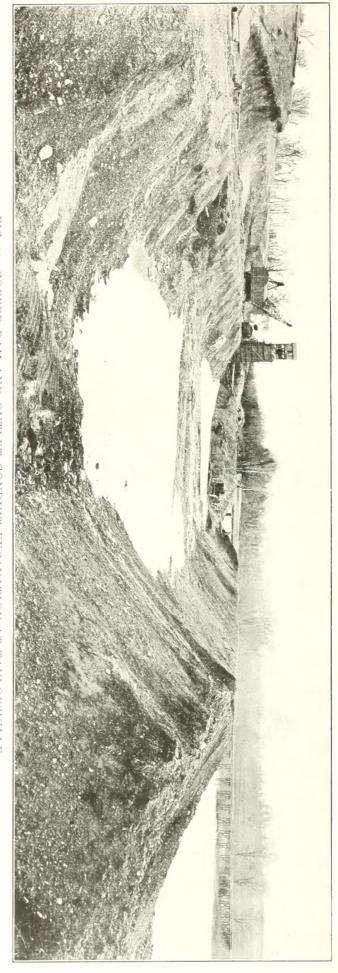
COFFER DAM AND OUTLET CONDUIT EXCAVATION AT TAYLORSVILLE.
